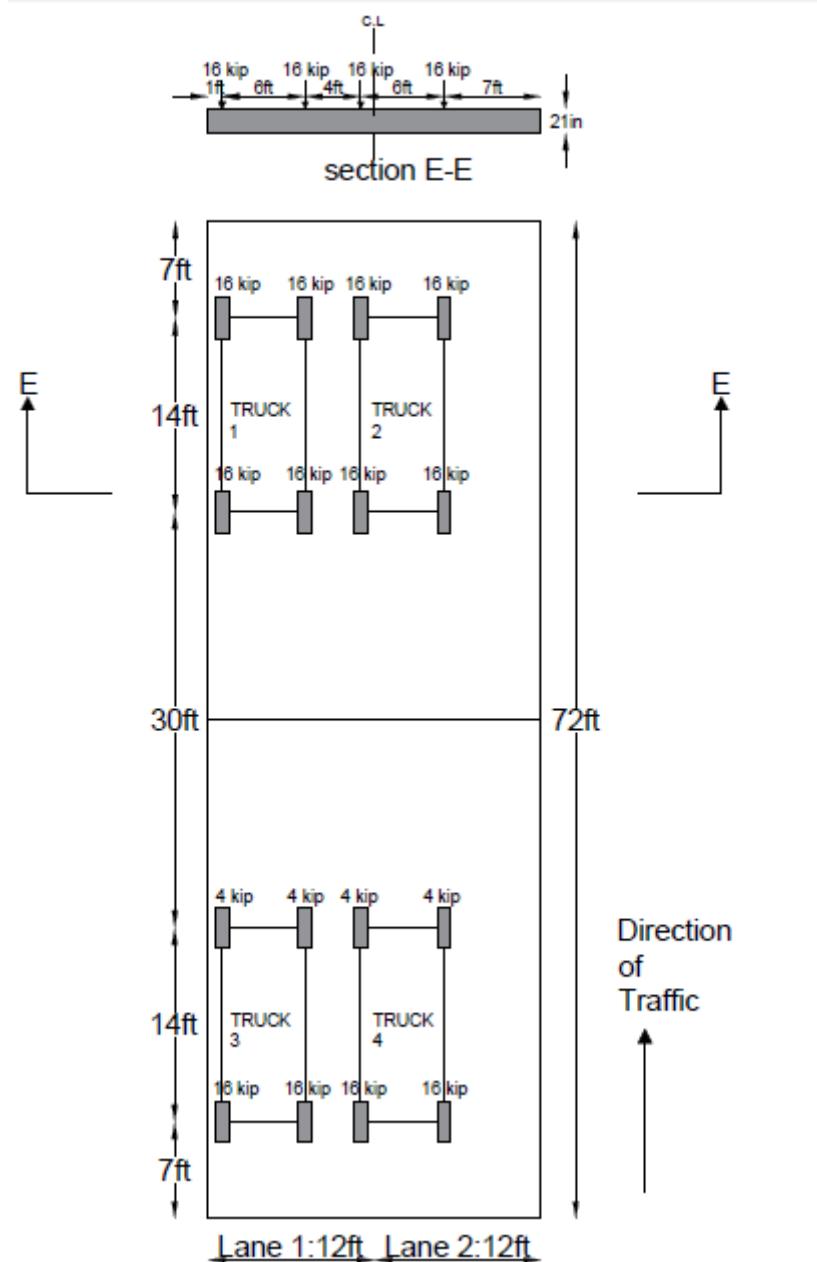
Typical Cross-Section and Plan of Two-Lane 36ft Span Bridge under Edge Loading Condition with no railing (Negative moment).
